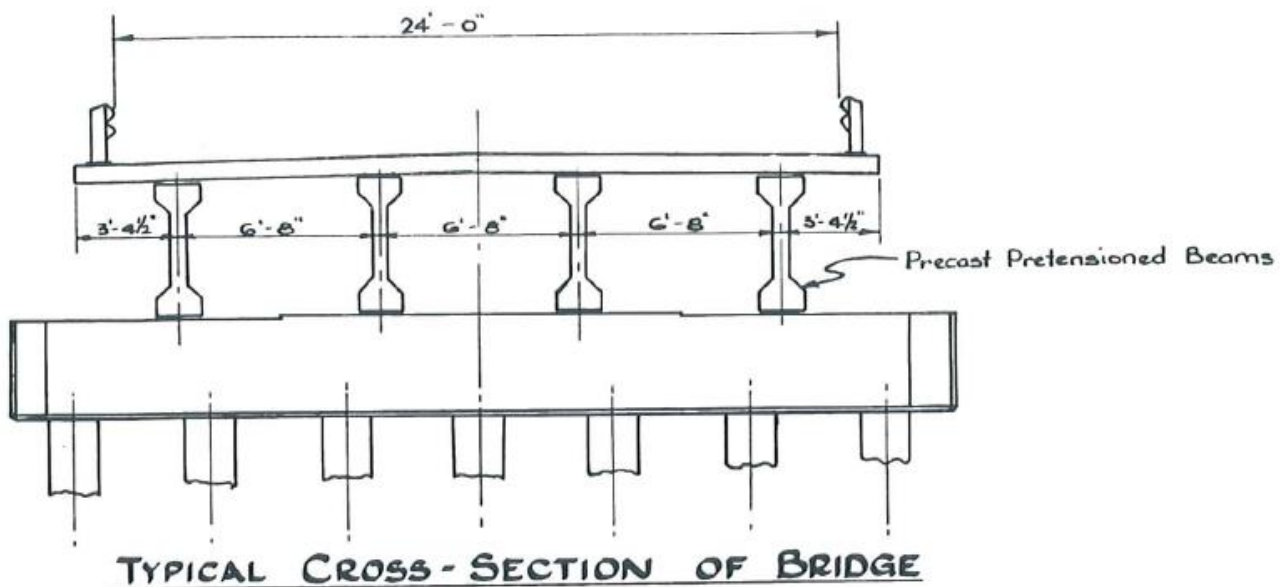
Typical structural cross section of the Tiwai Point bridge, NZ.
